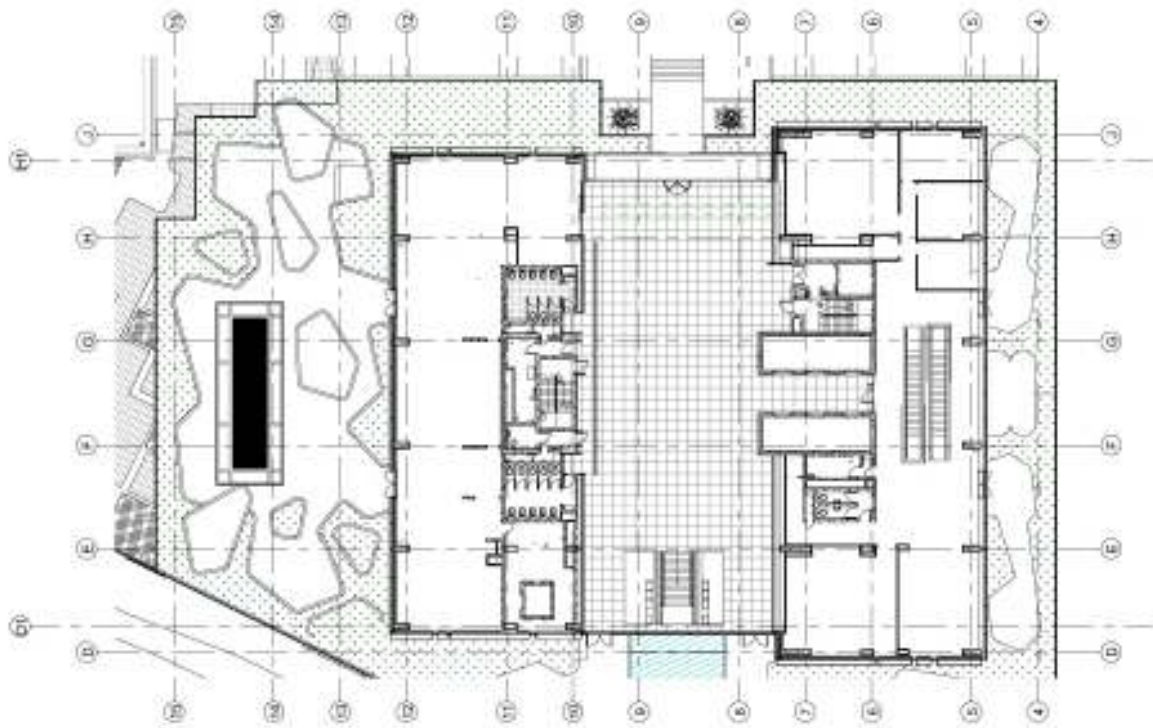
Upper Ground Level with grassed terraces and water fountain on the, atrium space between the towers with lift lobby on the south tower and staircase on the north joint by the bridge above (courtesy Paragon Architects)
